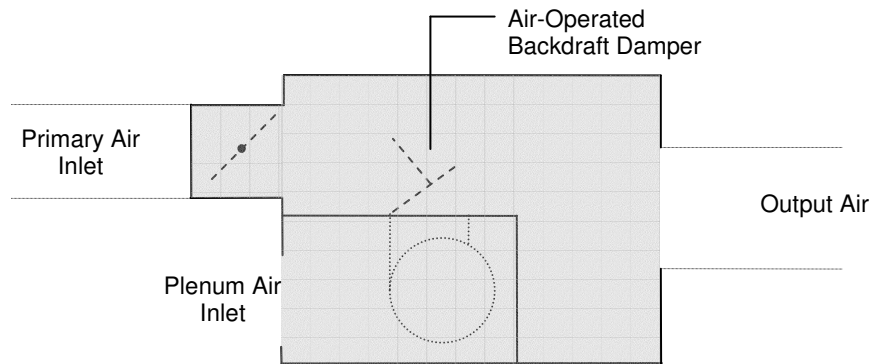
Schematic of Group A Parallel Terminal Units, plan view
